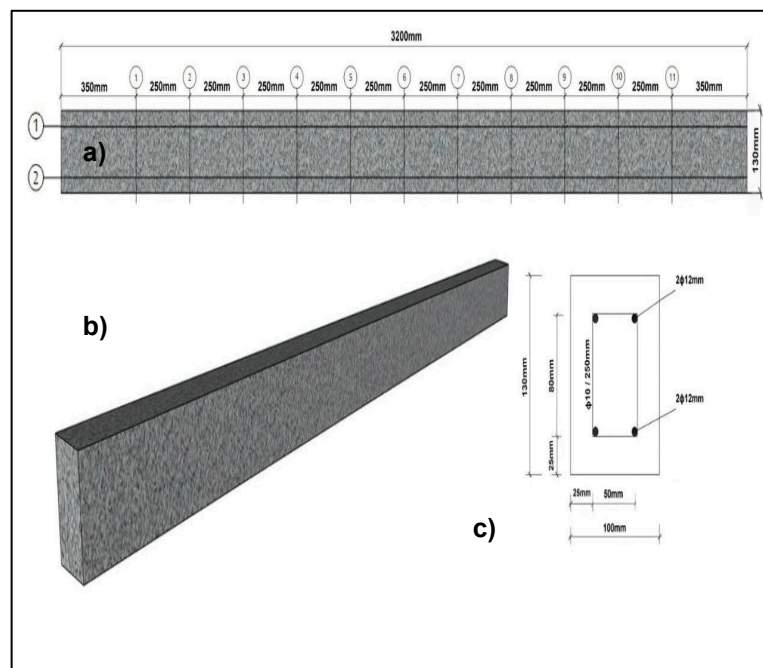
The tested concrete beam: a) longitudinal view; b) perspective view; c) cross-section.
